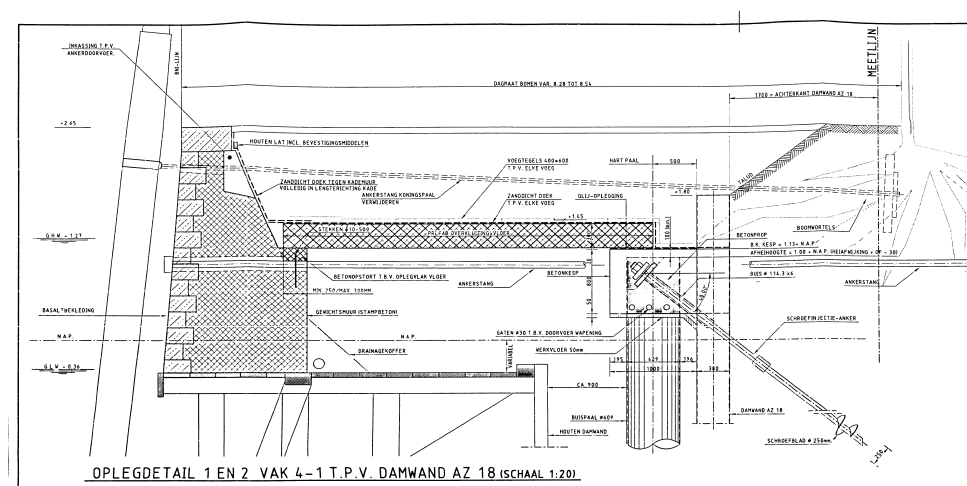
Detail of the concrete floorslab (middle), concrete capping beam (right) and anchored steel piling (bottom right) addition of 2002-2004 in relation to the original stoney wall (left) and the timber floor (bottom left). [61].
